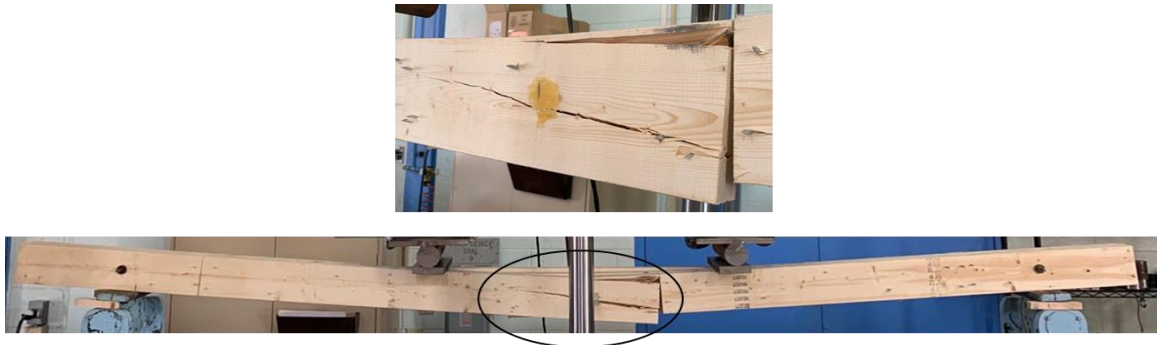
Specimens 3-5-L and 3-5-H showing the splitting failure mode around the midspan
